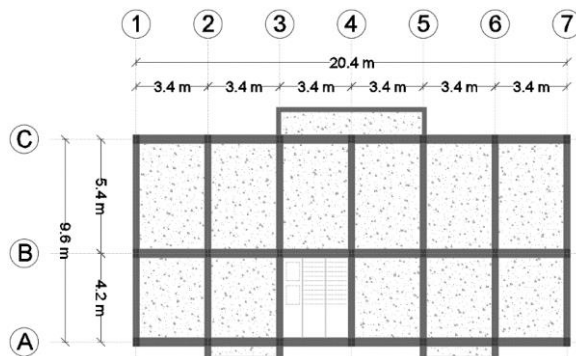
The plan view of the Template Design 2 (TD_2) building
